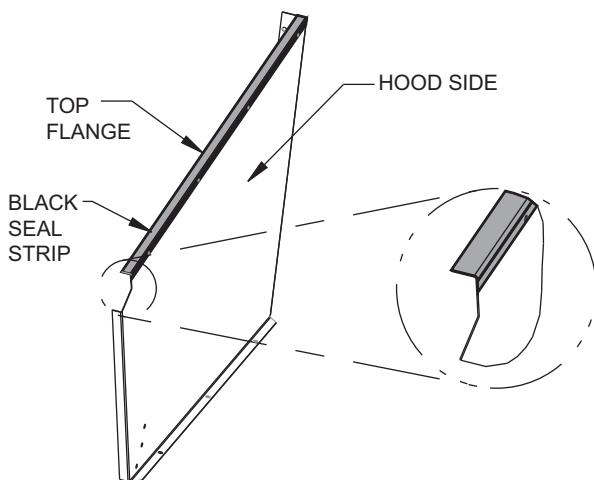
Adding Seal Strip to Top of Hood Sides
